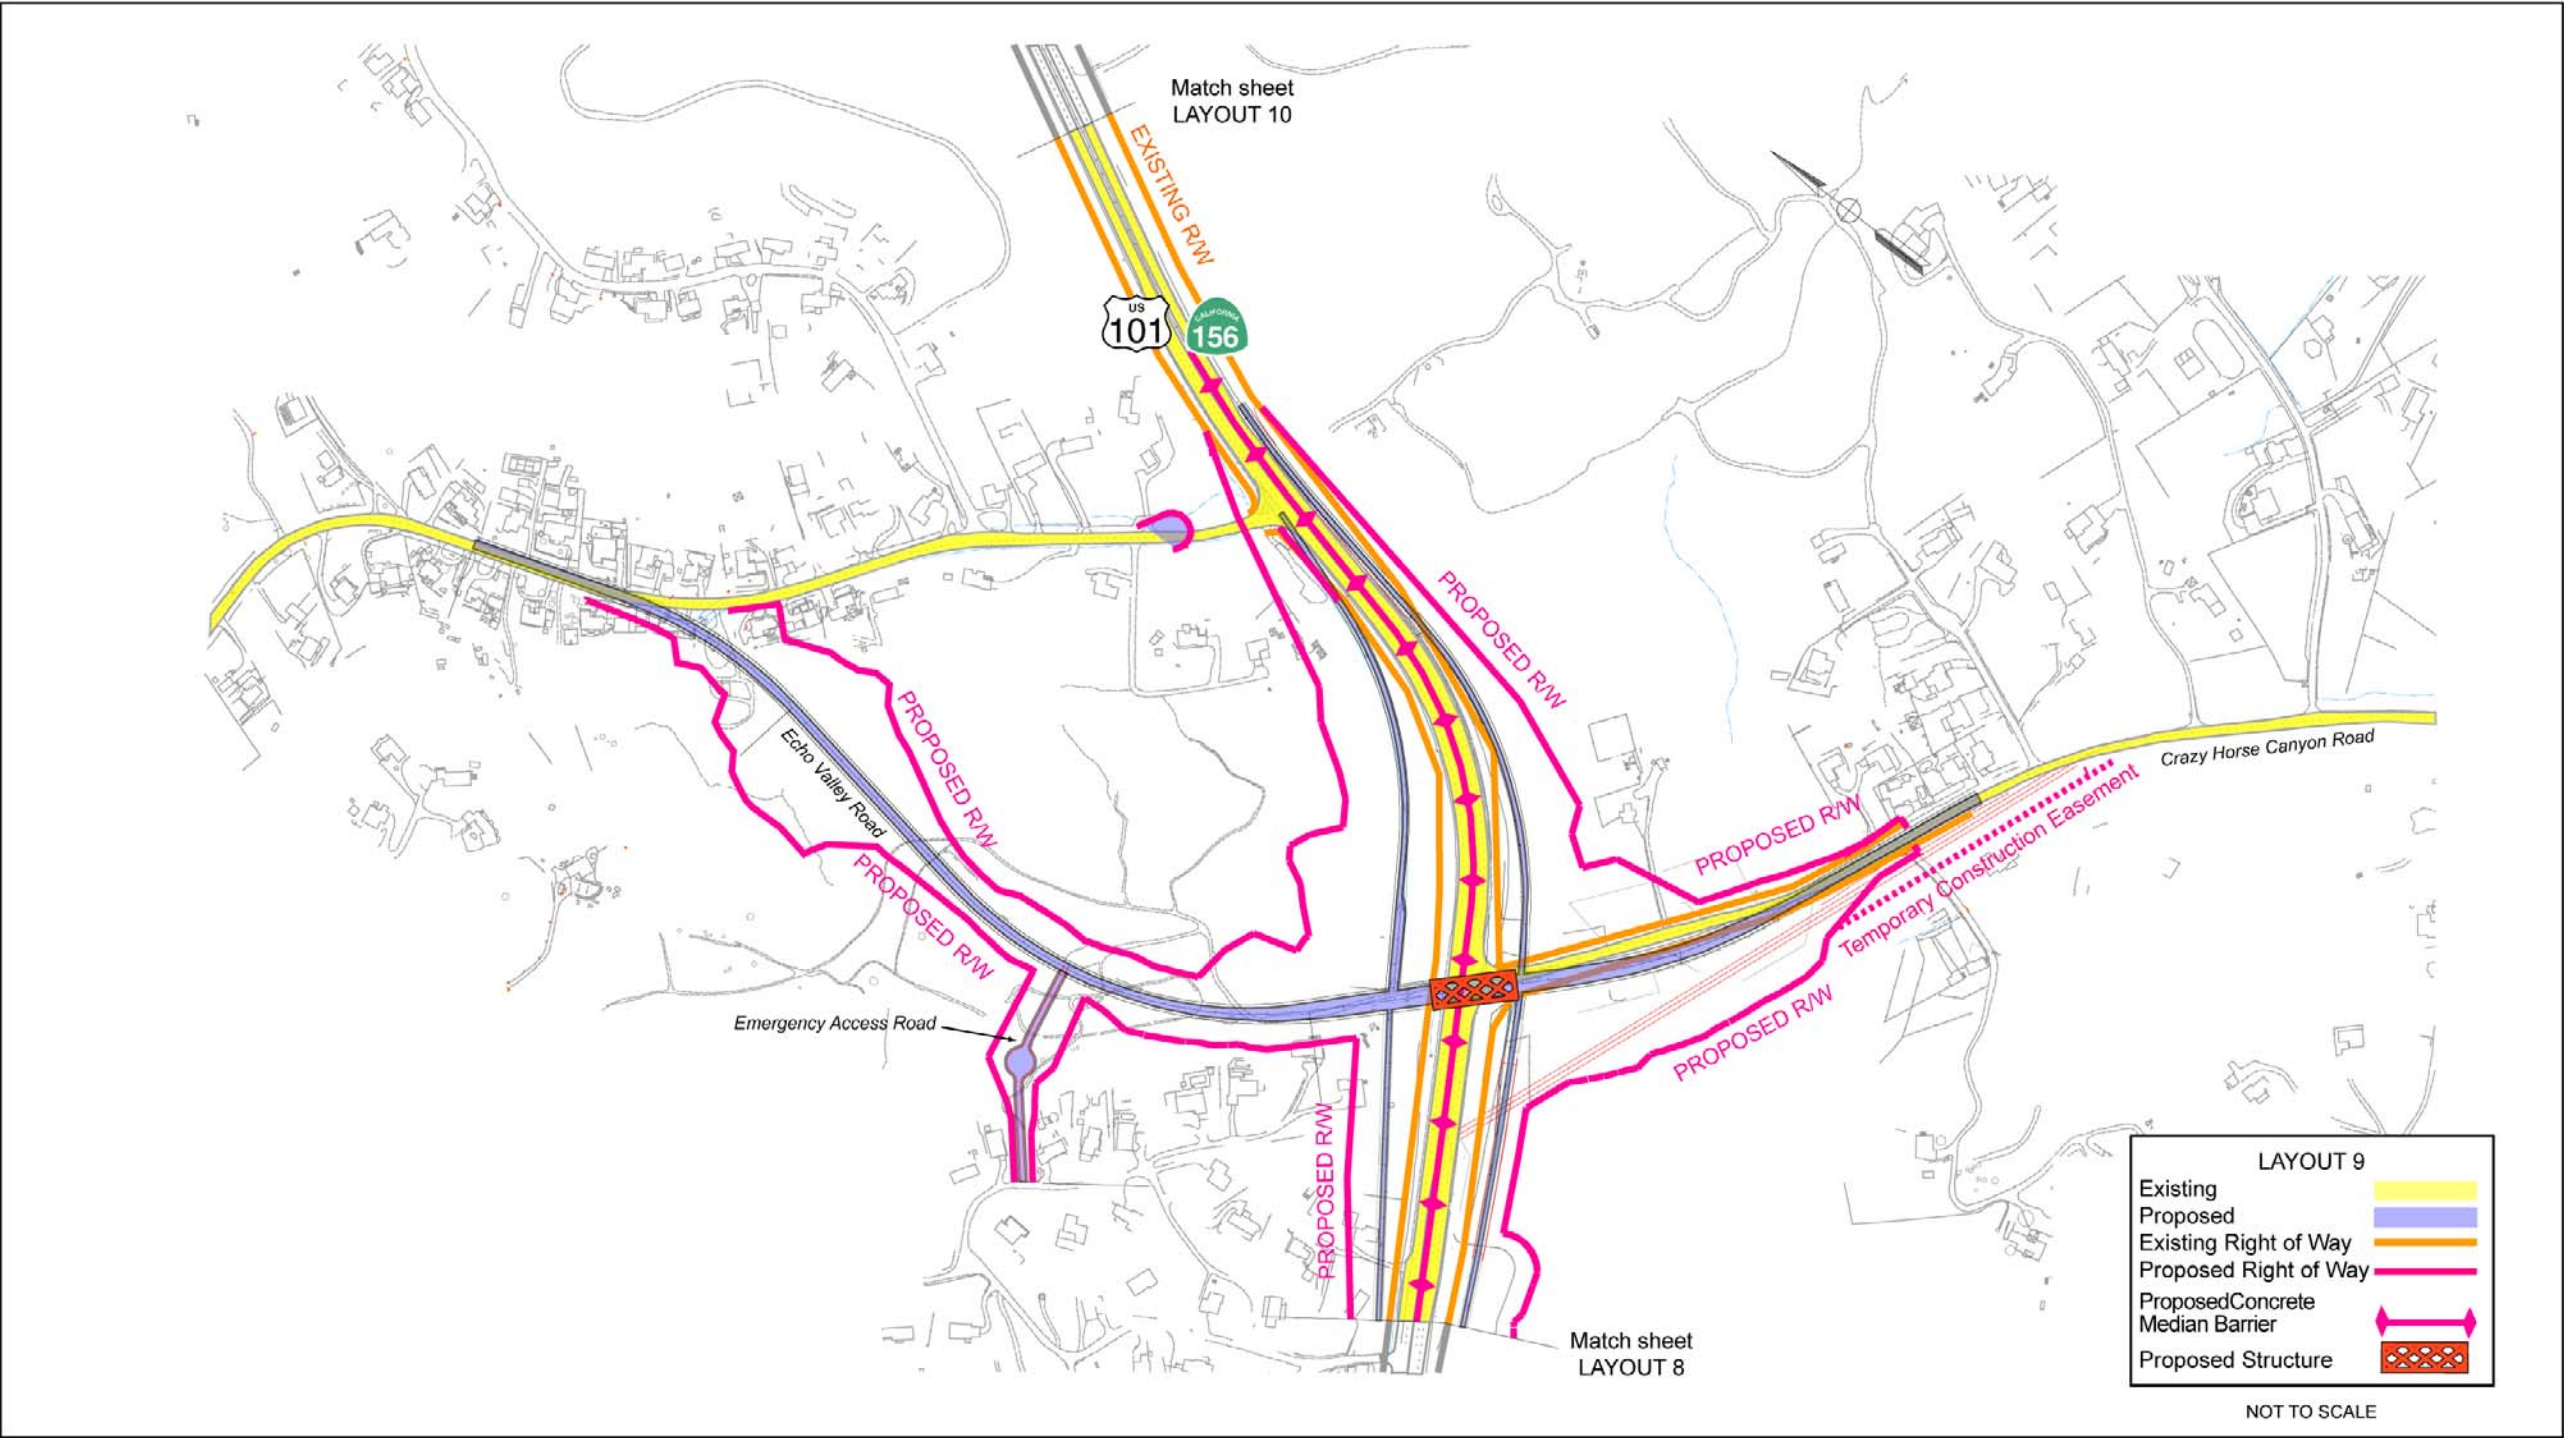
Build Alternative Design, Echo Valley Road Location
